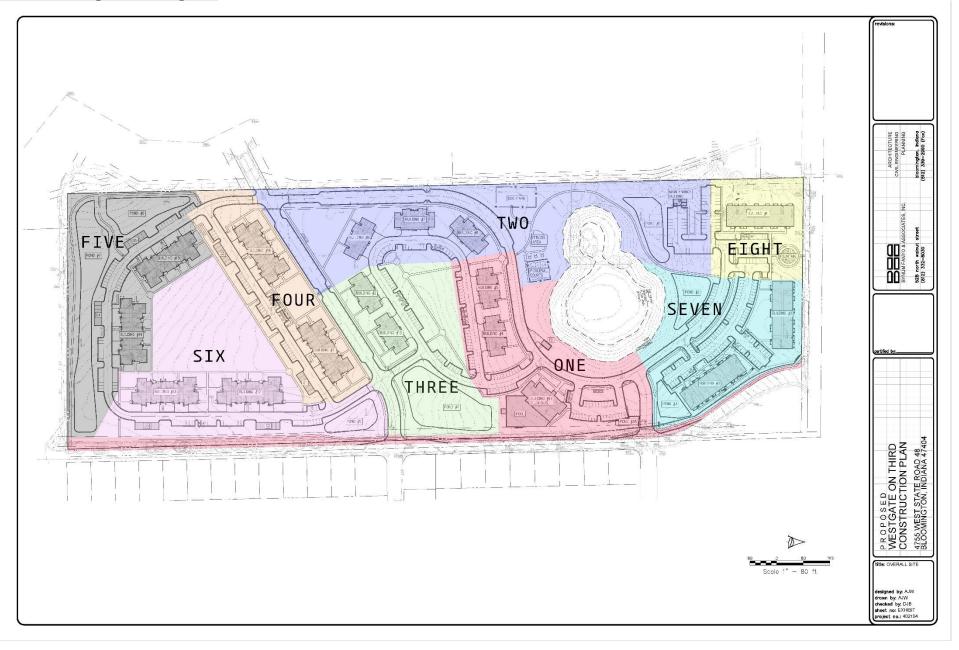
Conceptual Development Plan with Proposed Changes
